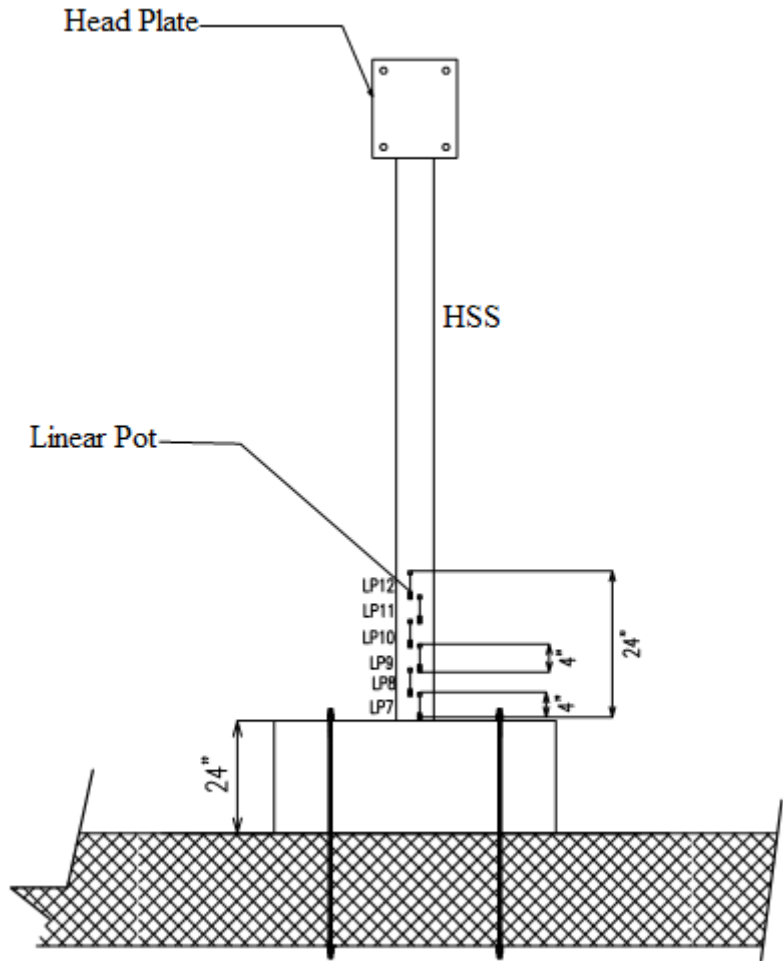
Schematic Diagram for a Typical West Side View of Tested CFSSP-Wall Specimen
